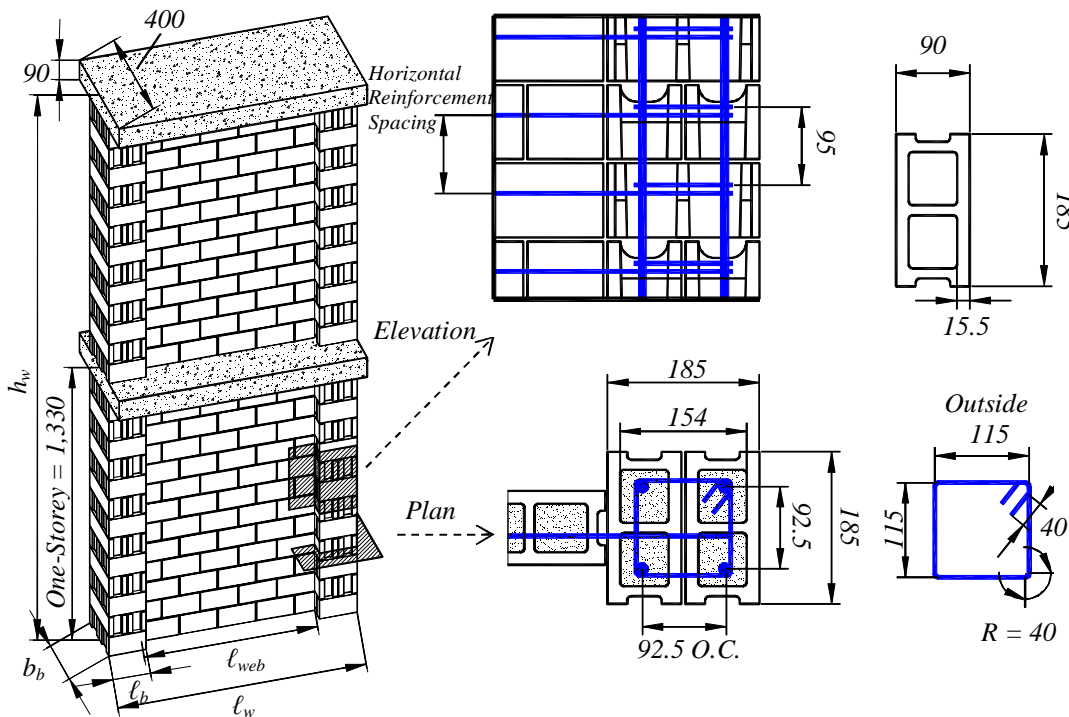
Typical Wall Specimen and Boundary Element Detailing
